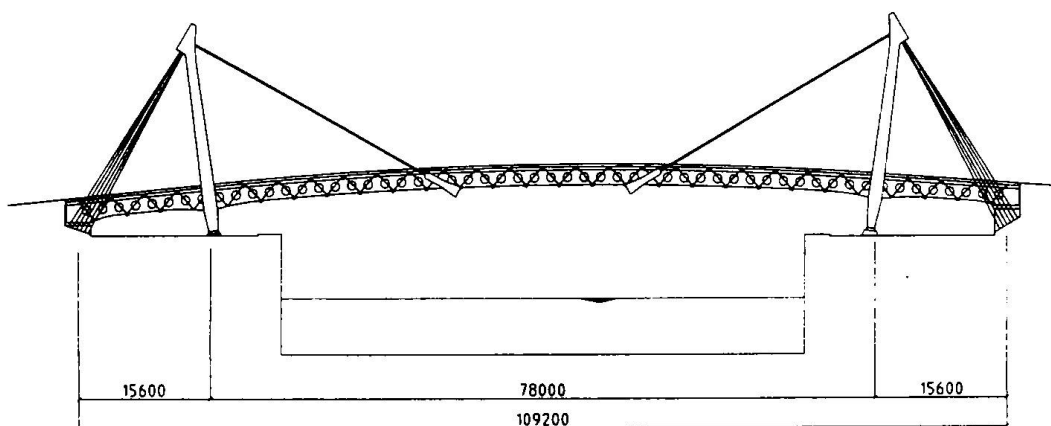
View of the cable-stayed road bridge Freudenau/Austria
